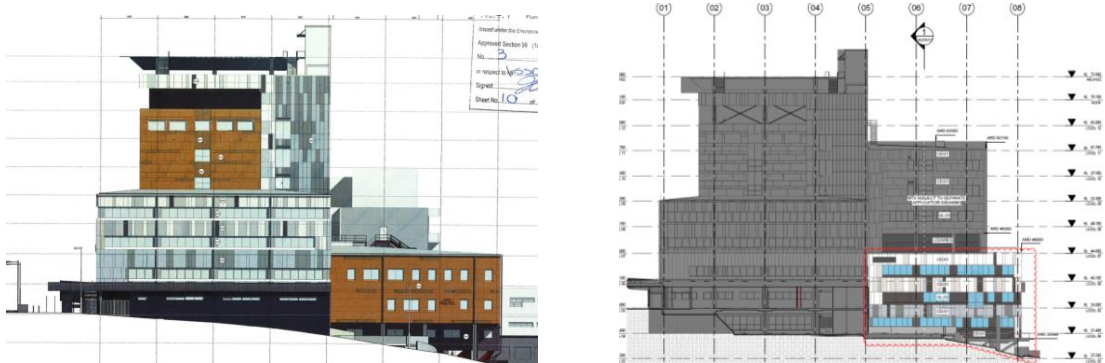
Approved vs Proposed Western Elevation of Stage 3 (Source: First image Woods Bagot & second image Conrad Gargett)
